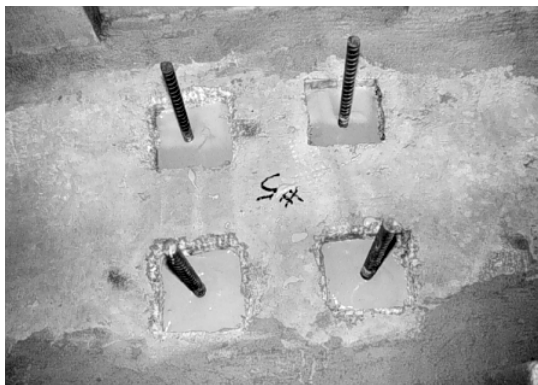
Specimen Location Specimen Details<sup>2</sup>
